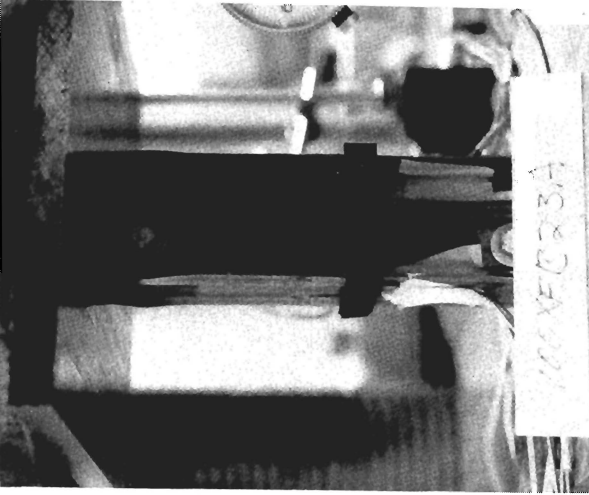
Typical Failure of I-Beams with Unstiffened Flanges
